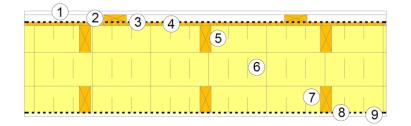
Wall section detail of the Tree Eco-Village home in plan view (double stud wall).
